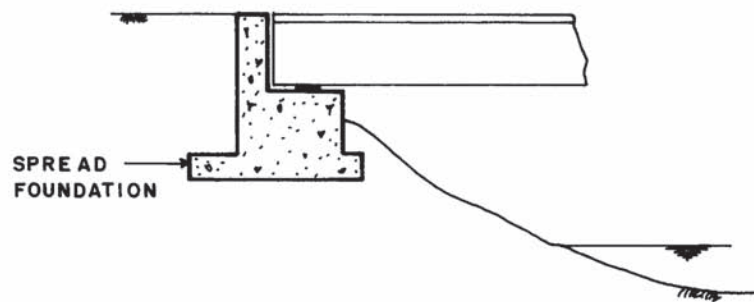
BANK SEAT ABUTMENT ON SPREAD FOUNDATION
